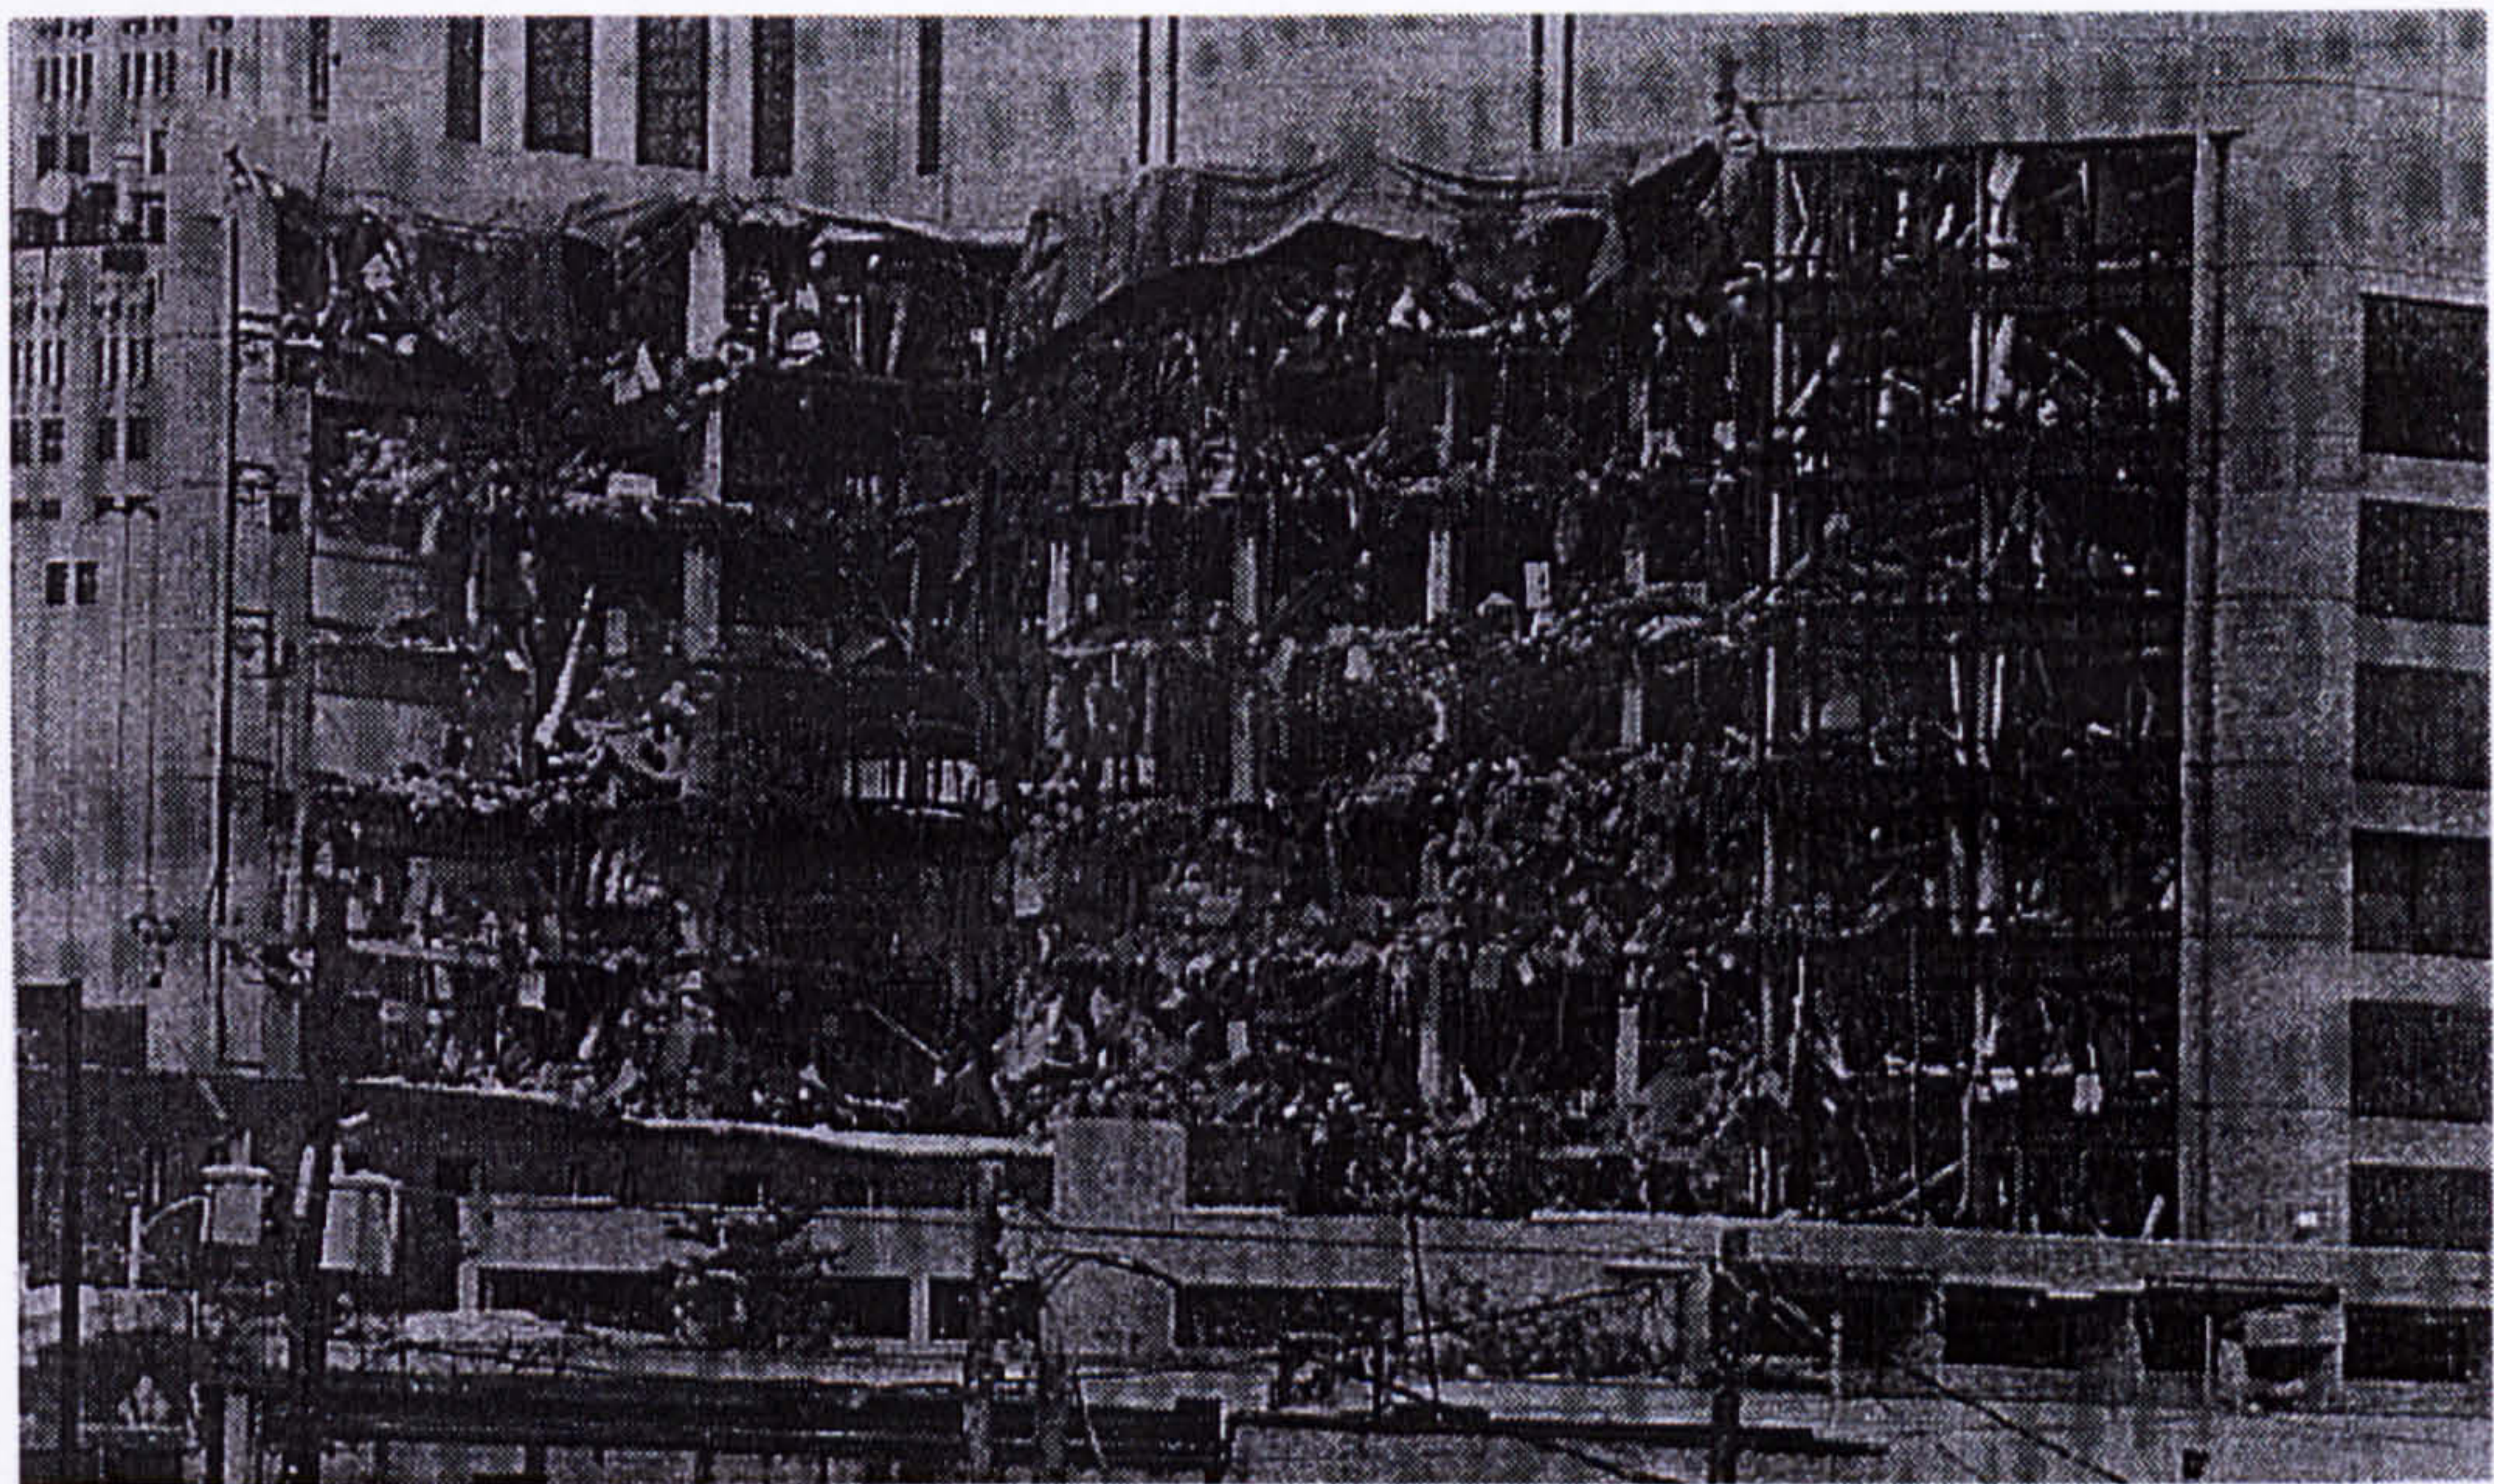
Damage resulting from the explosion to the Alfred P Murrah building [3]
